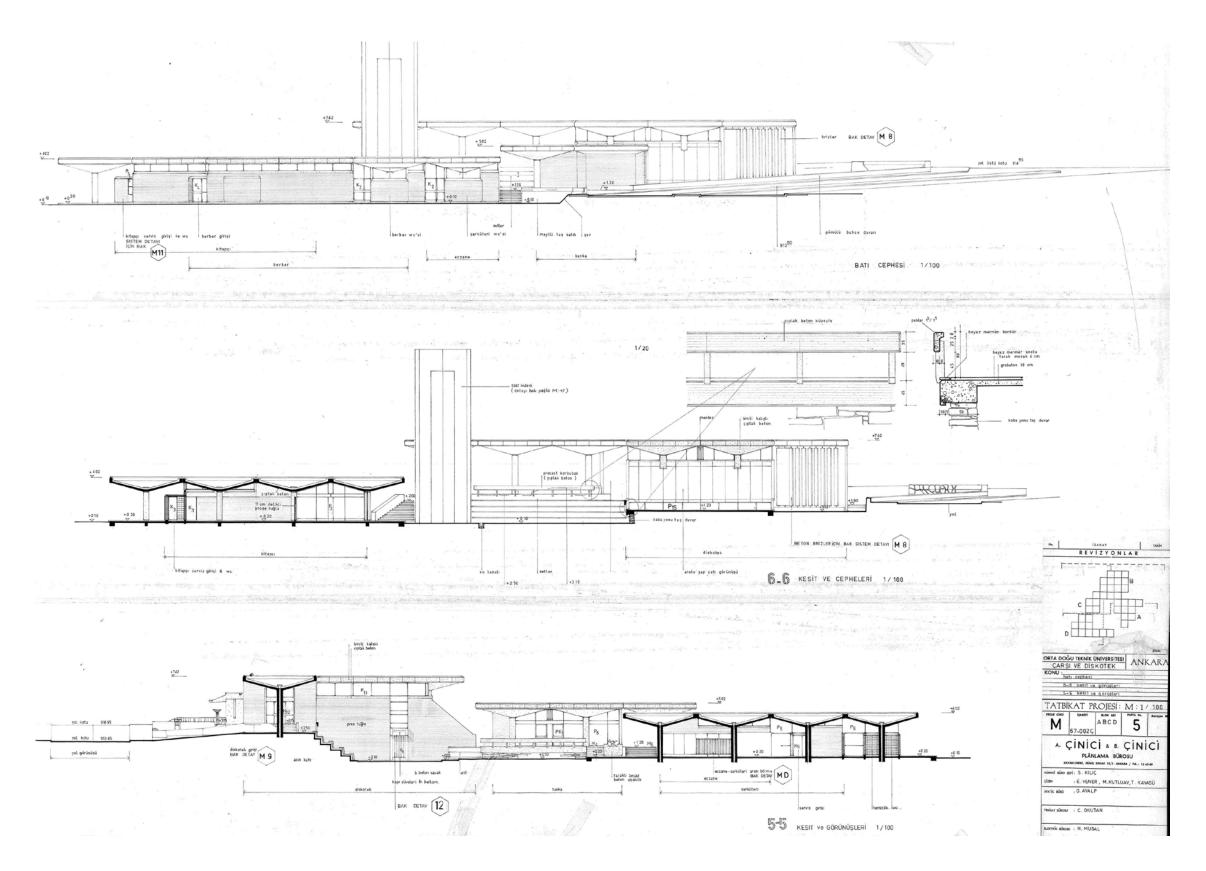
Original Drawing; West Facade, 6-6 Section, 5-5 Section Source: METU Directorate of Construction & Technical Works
